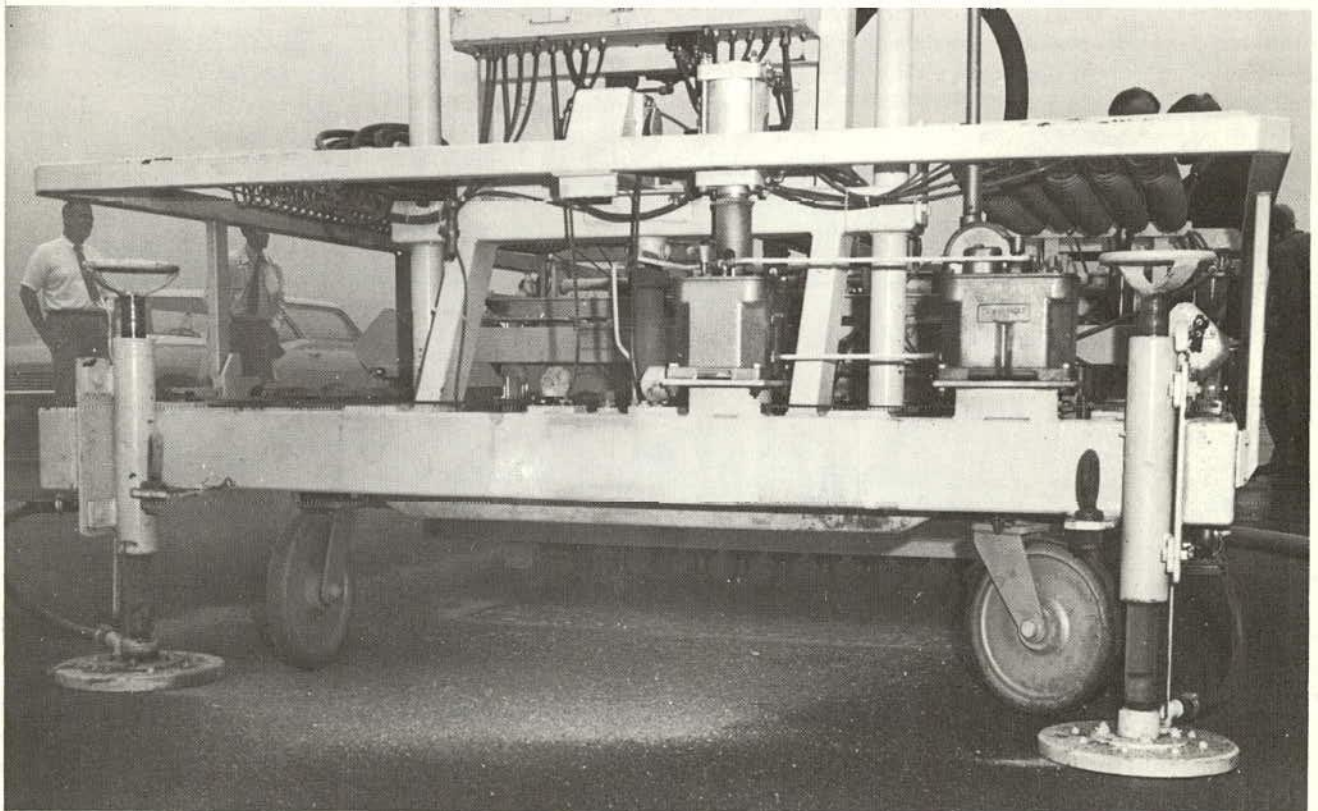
Klarcrete machine automatically cuts rectangular holes for pavement patching. (NCHRP 14-2)
